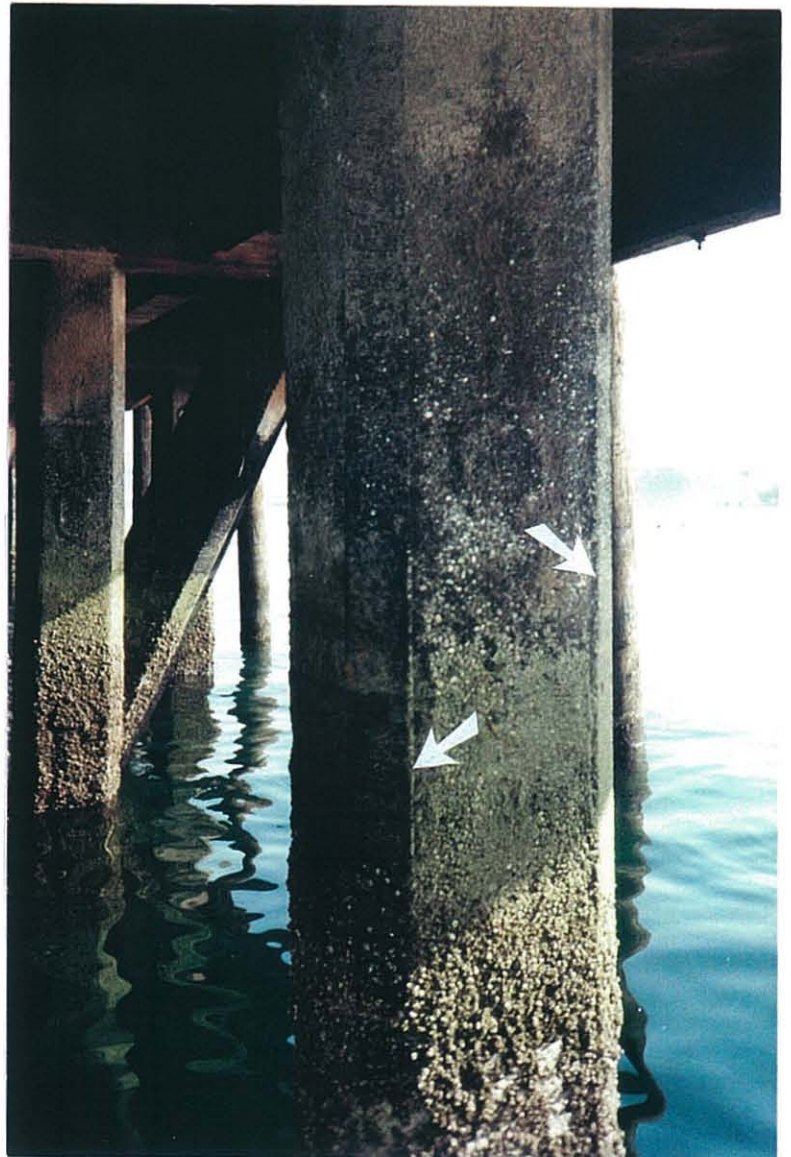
General view of 24 in. octagonal prestressed piles supporting concrete wharf.
